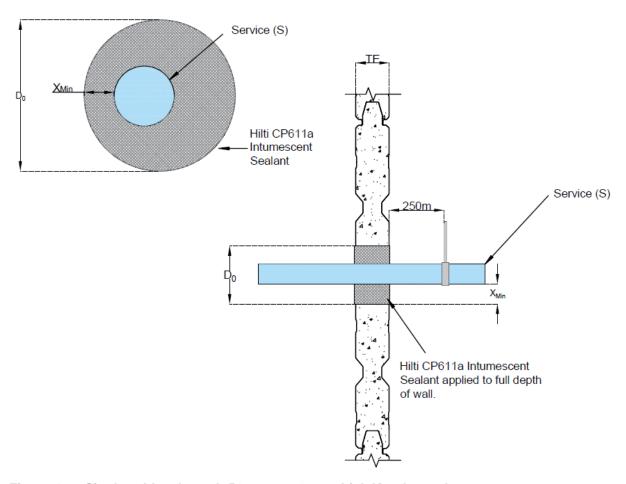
Single cables through 51 mm or 78 mm thick Korok panels
